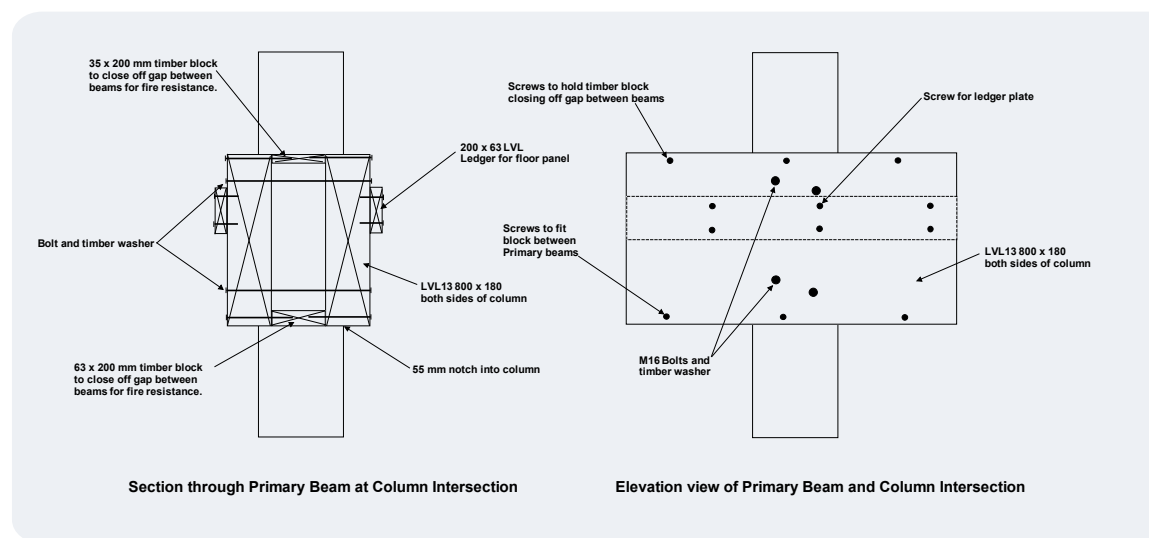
Screw and bolt fixing of beam to columns, Levels 2 to roof.
